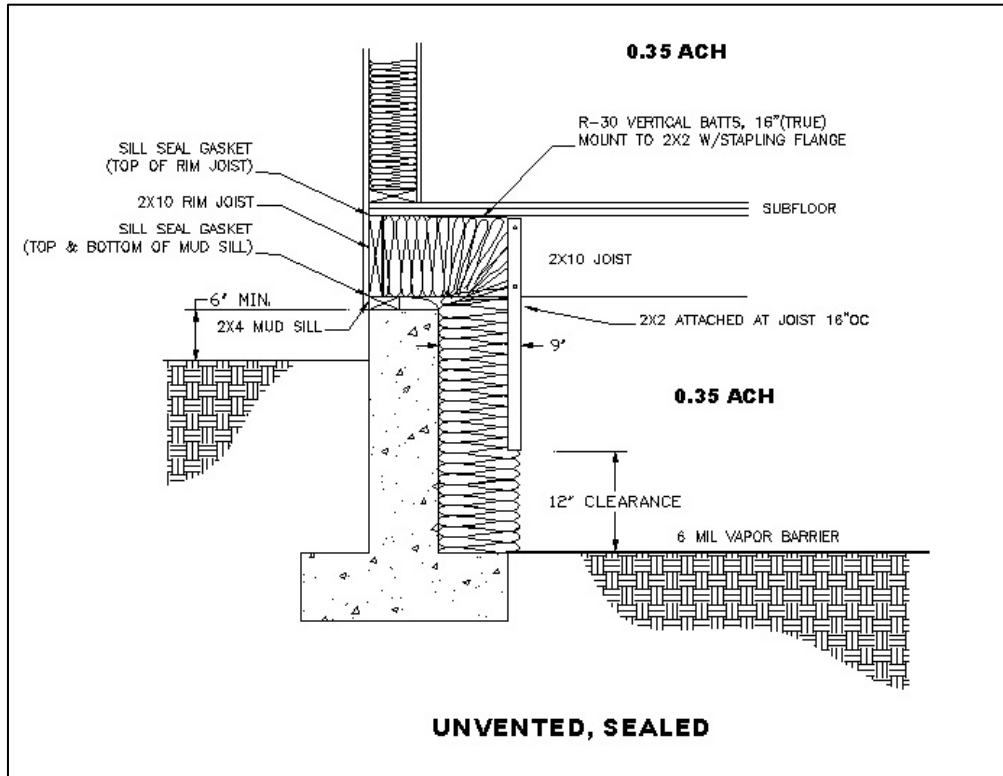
Crawlspace with perimeter insulation and unvented foundation walls.
